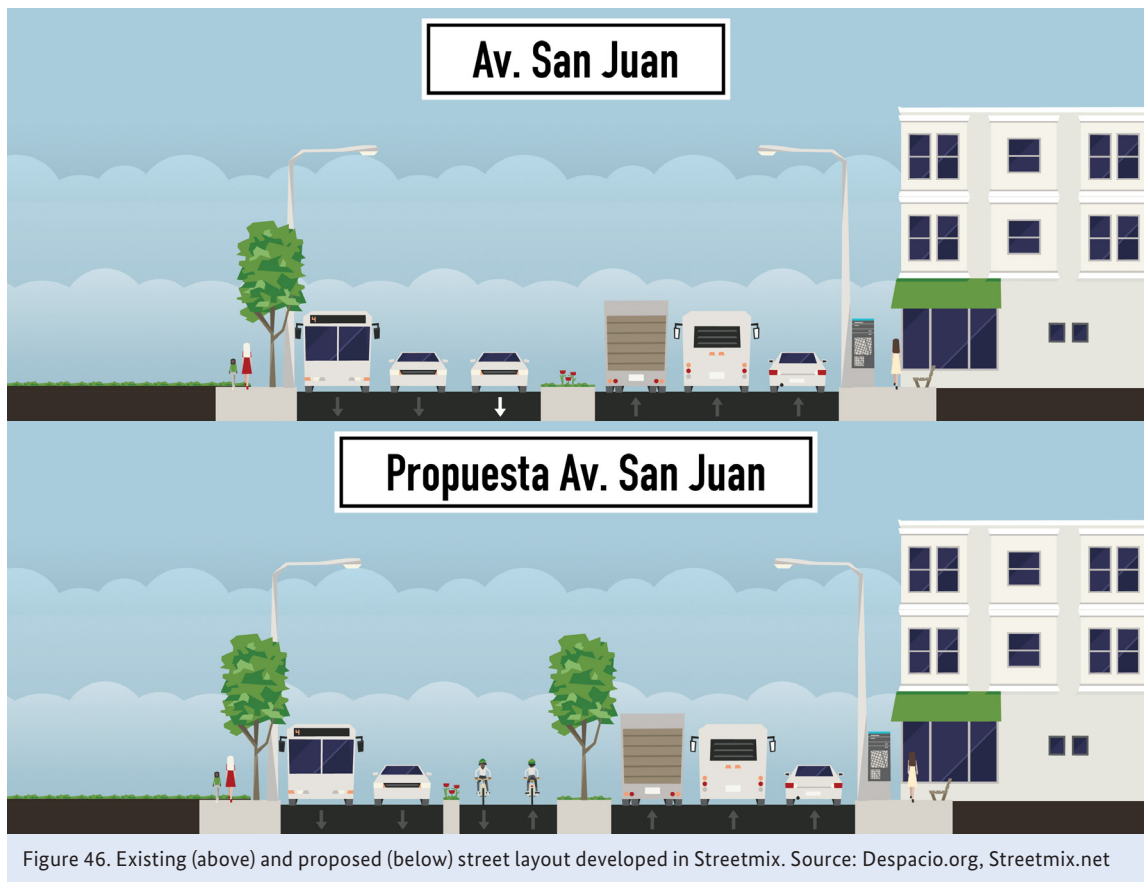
Existing (above) and proposed (below) street layout developed in Streetmix. Source: Despacio.org, Streetmix.net
